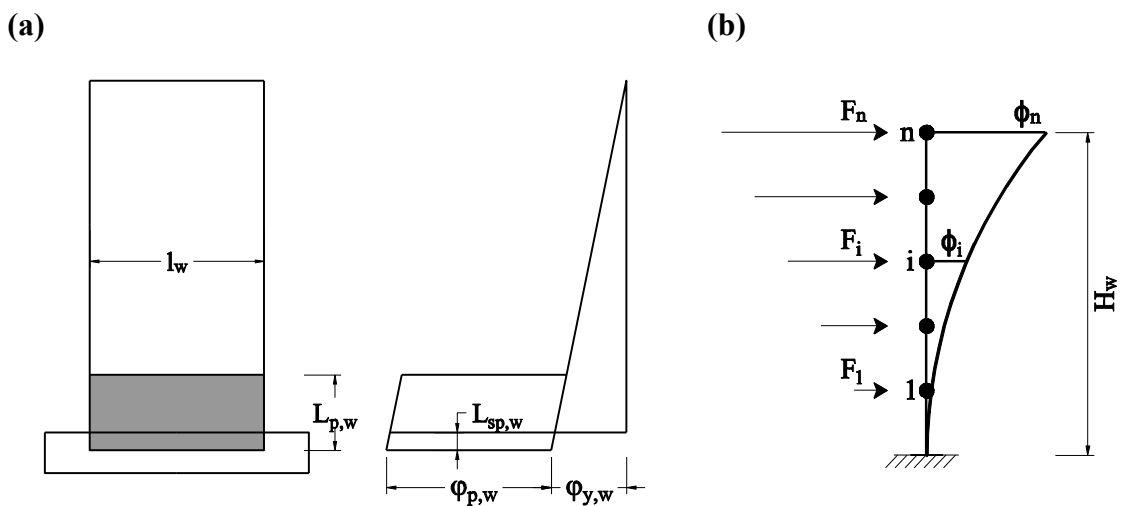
(a): Plastic hinge for walls, (b): Inverse triangular load of horizontal forces and wall displacement shape.
